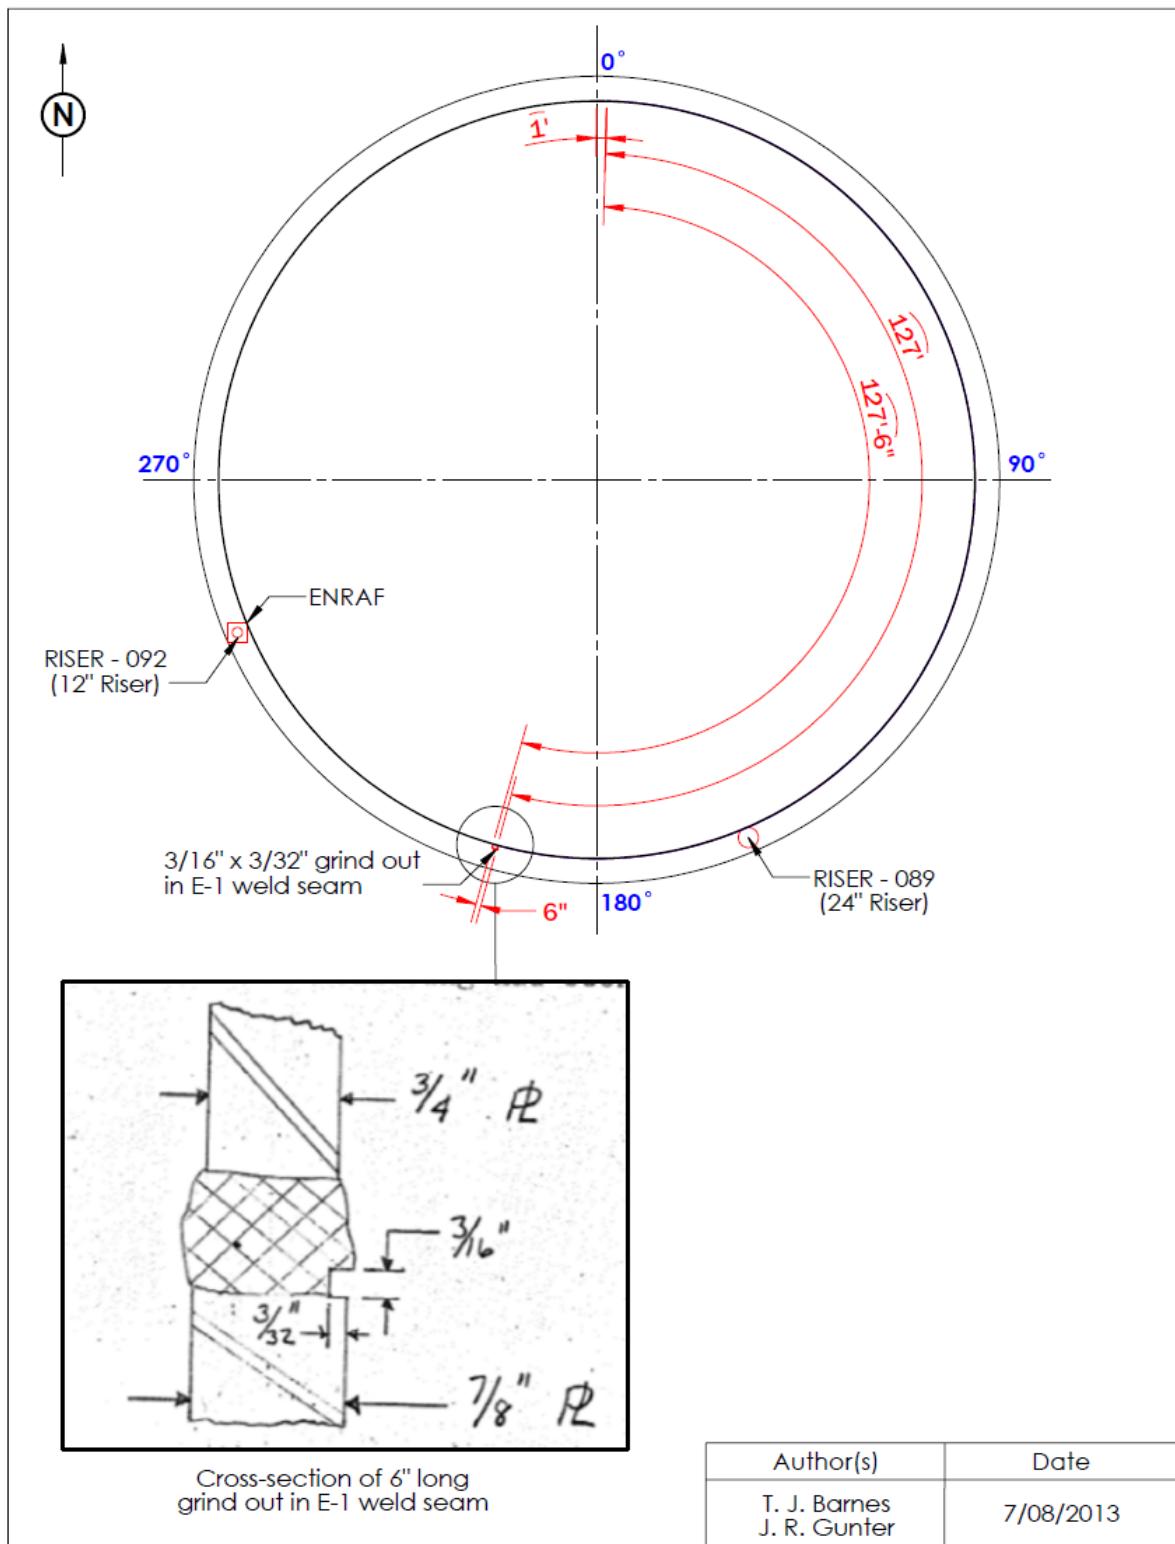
Tank AZ-101 Weld Grind Out in E-1 Seam
